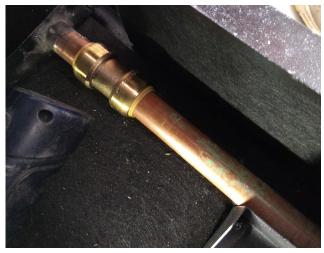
Detailed view of Sharkbite coupling of drain pan to drain pipe
